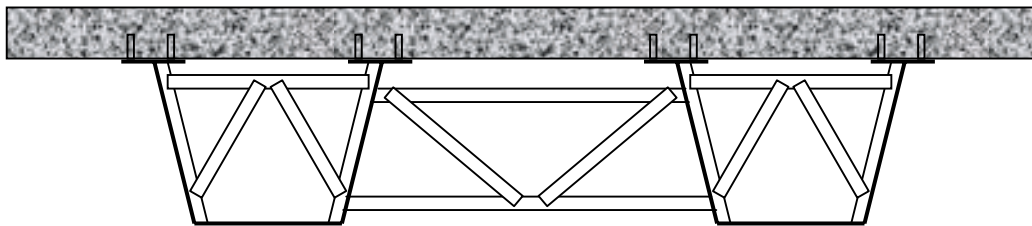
A Typical Cross Section of a Trapezoidal Box Girder System
